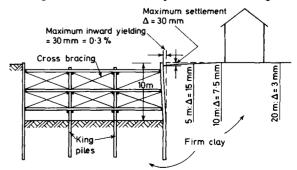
Bracing to wide excavation (also showing inward movement)
